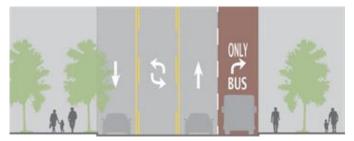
| Alternative 5 Cross-section of Tyco Road from Route 7 to Spring Hill Road
